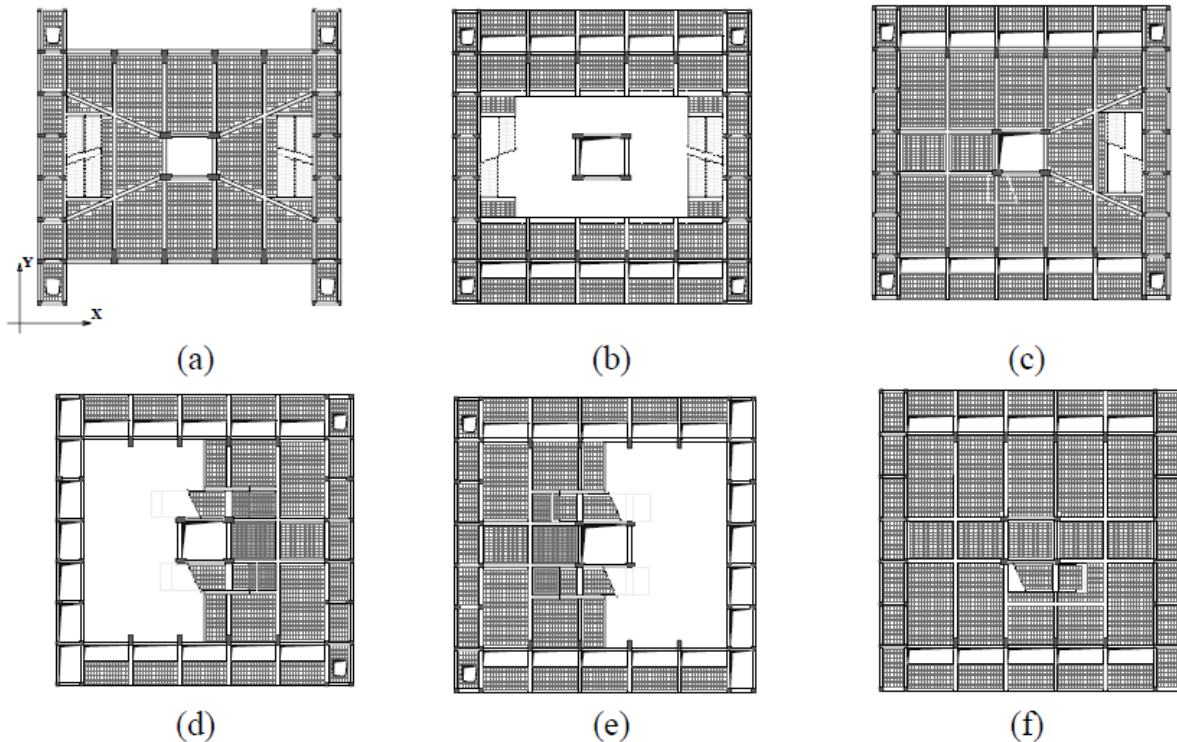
Tower of the Nations: structural drawings (a) first level plan; (b) second level plan; (c) third level plan; (d-e) typical plan; (f) tenth level plan.
